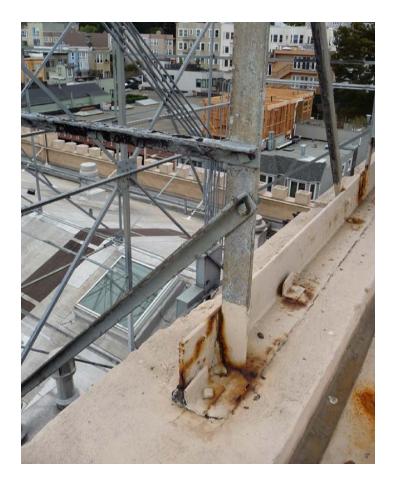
A typical "good" condition connection of the armature, on the lower roof (Mustard Building), within easy arm's reach
